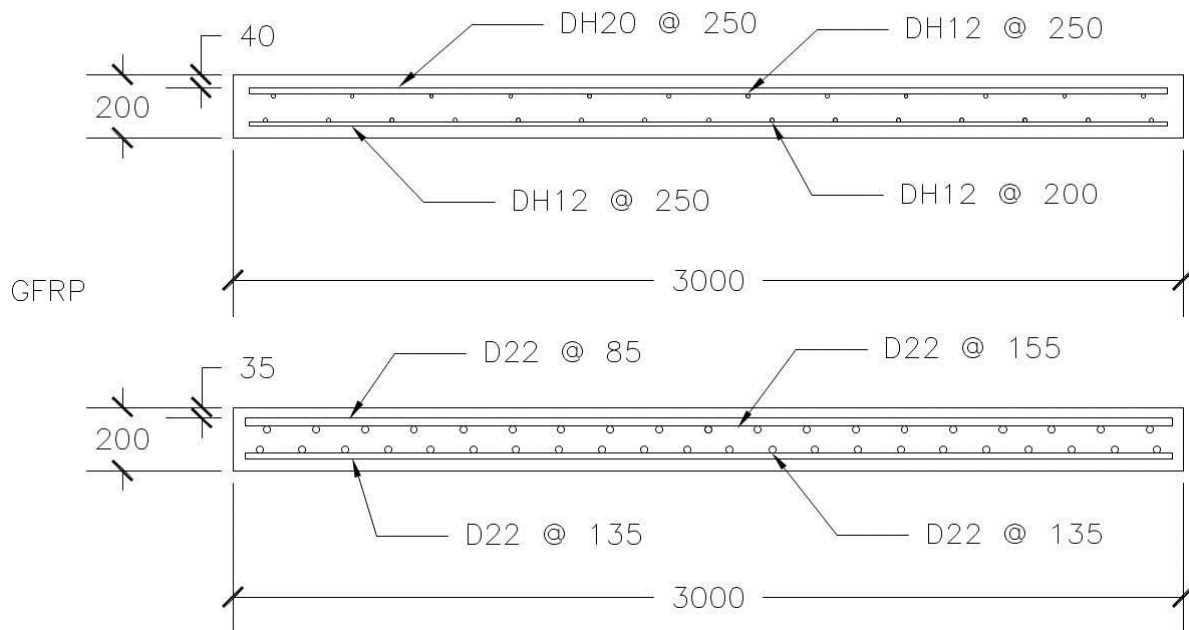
Transverse (main direction) cross-sections of steel and GFRP reinforced sections.
